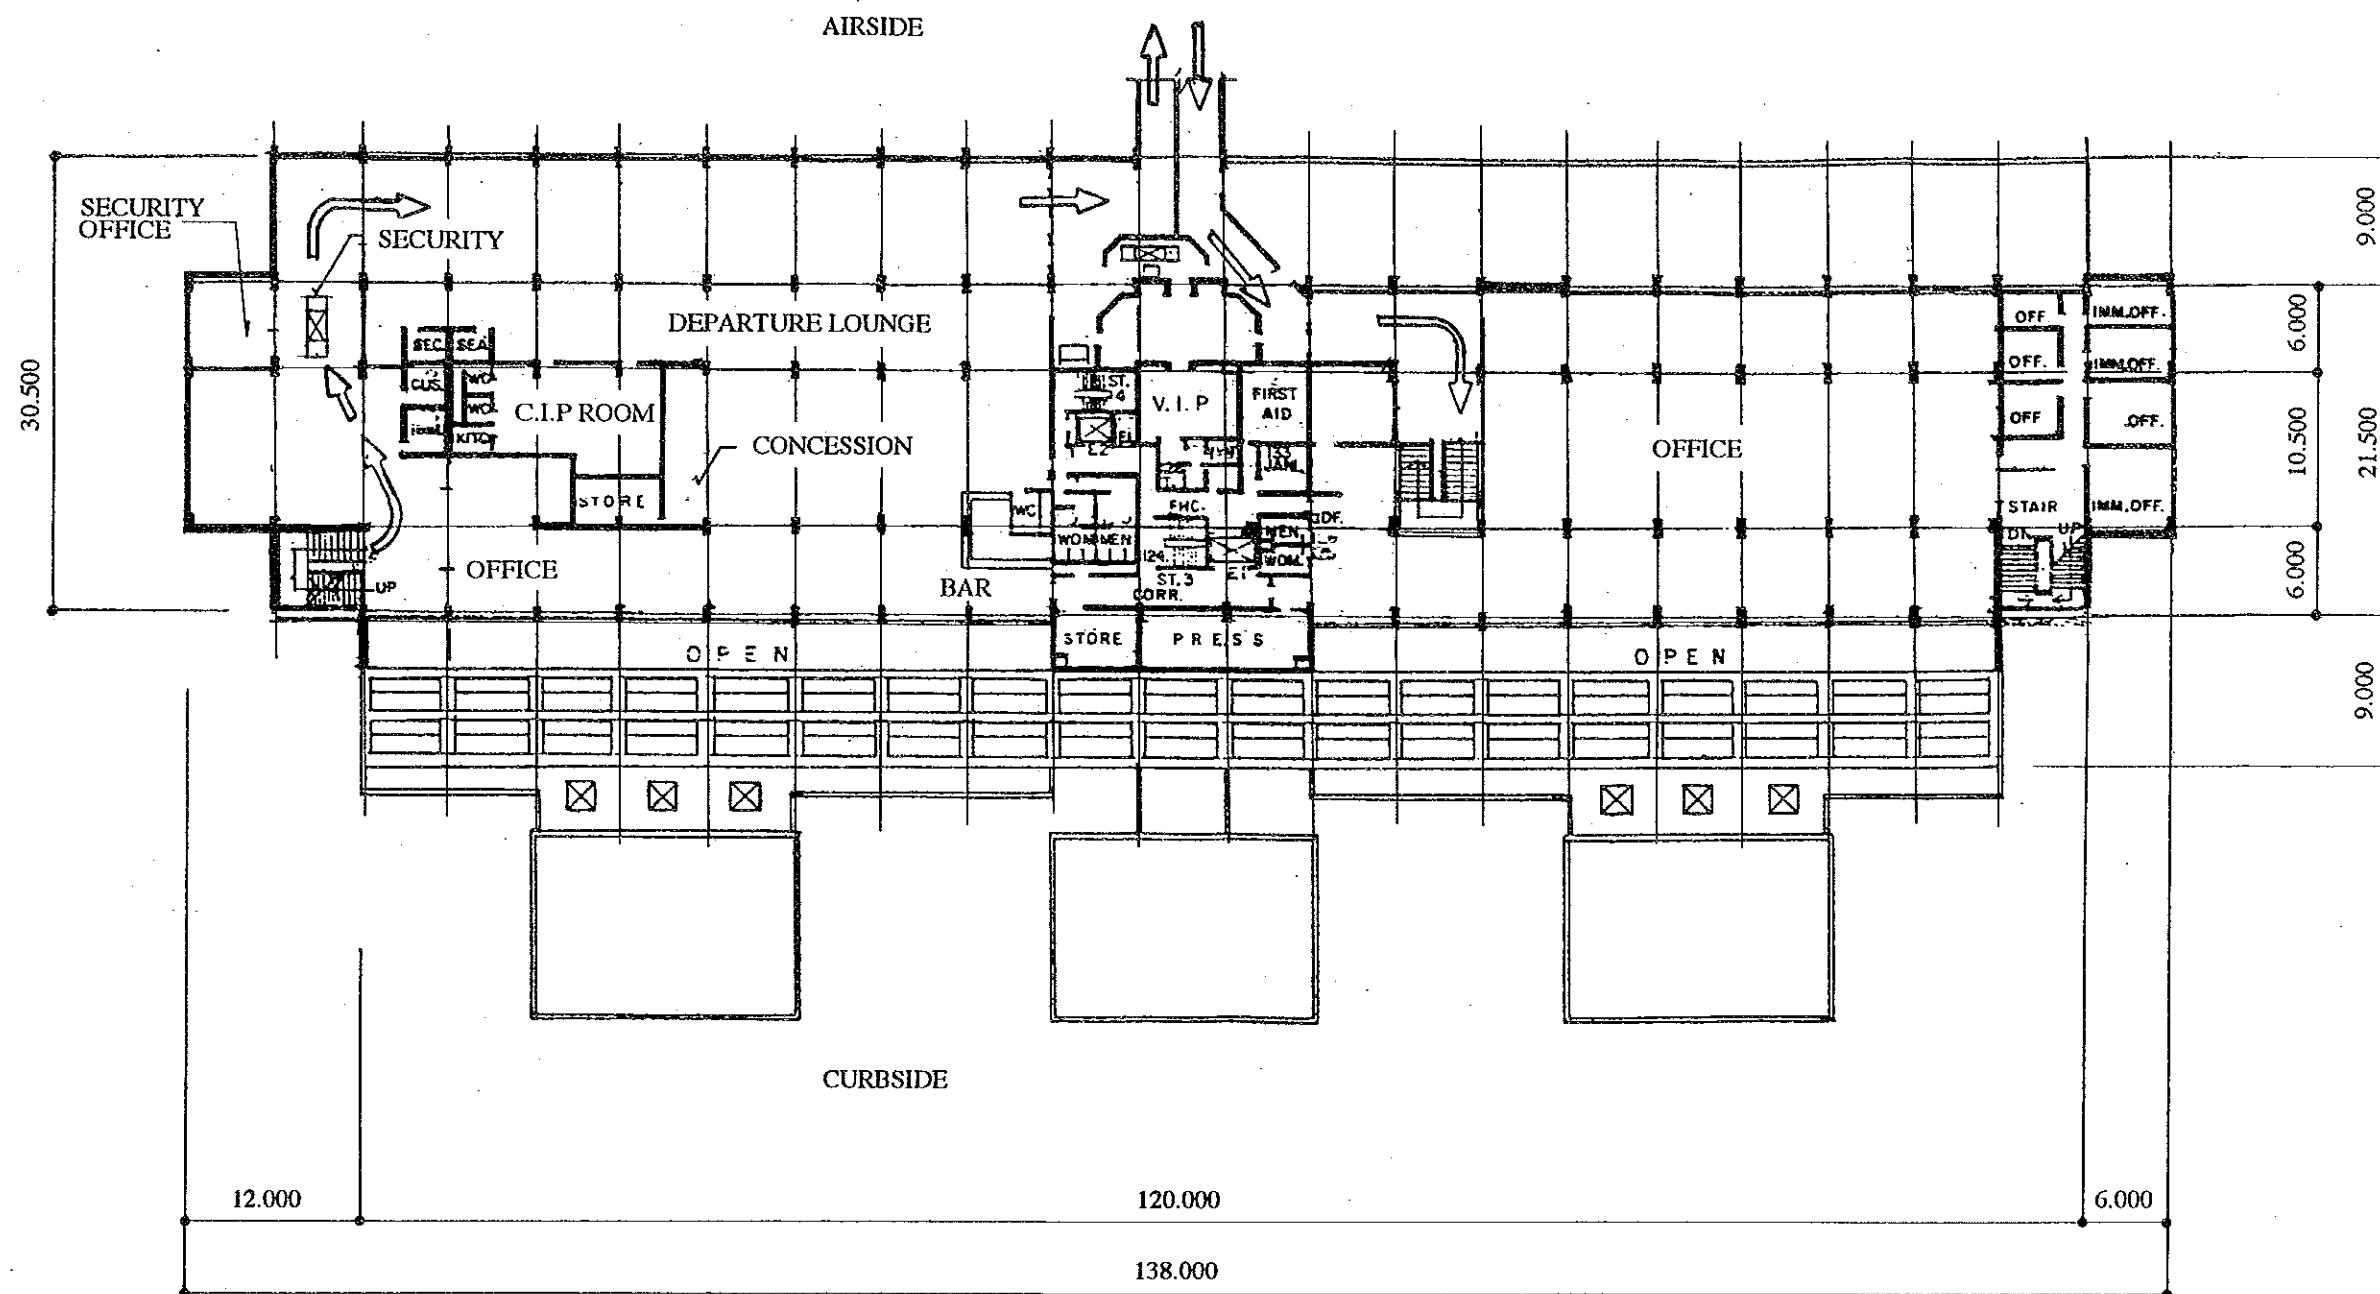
Domestic Passenger Terminal Building, Ground Floor Plan
